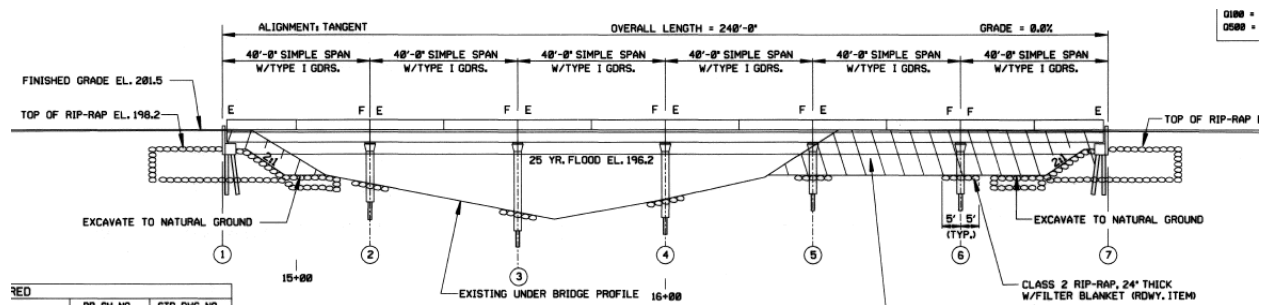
Bridge over Old Town Creek Elevation View (ALDOT 2013)
